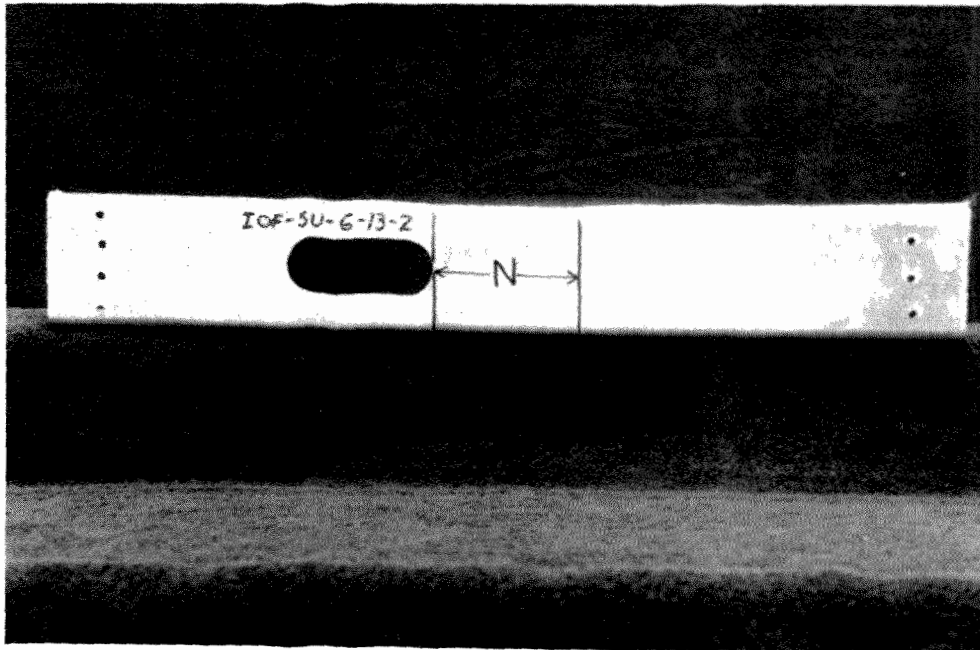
Typical Unreinforced IOF Web Crippling Failure, IOF-SU-6-13-2
